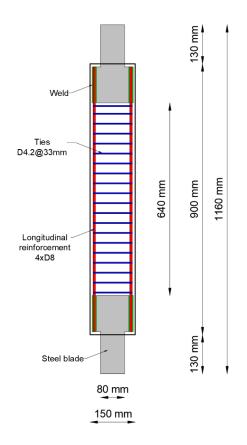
Vertical reinforcement layout for specimen reinforced with 4xD8.
